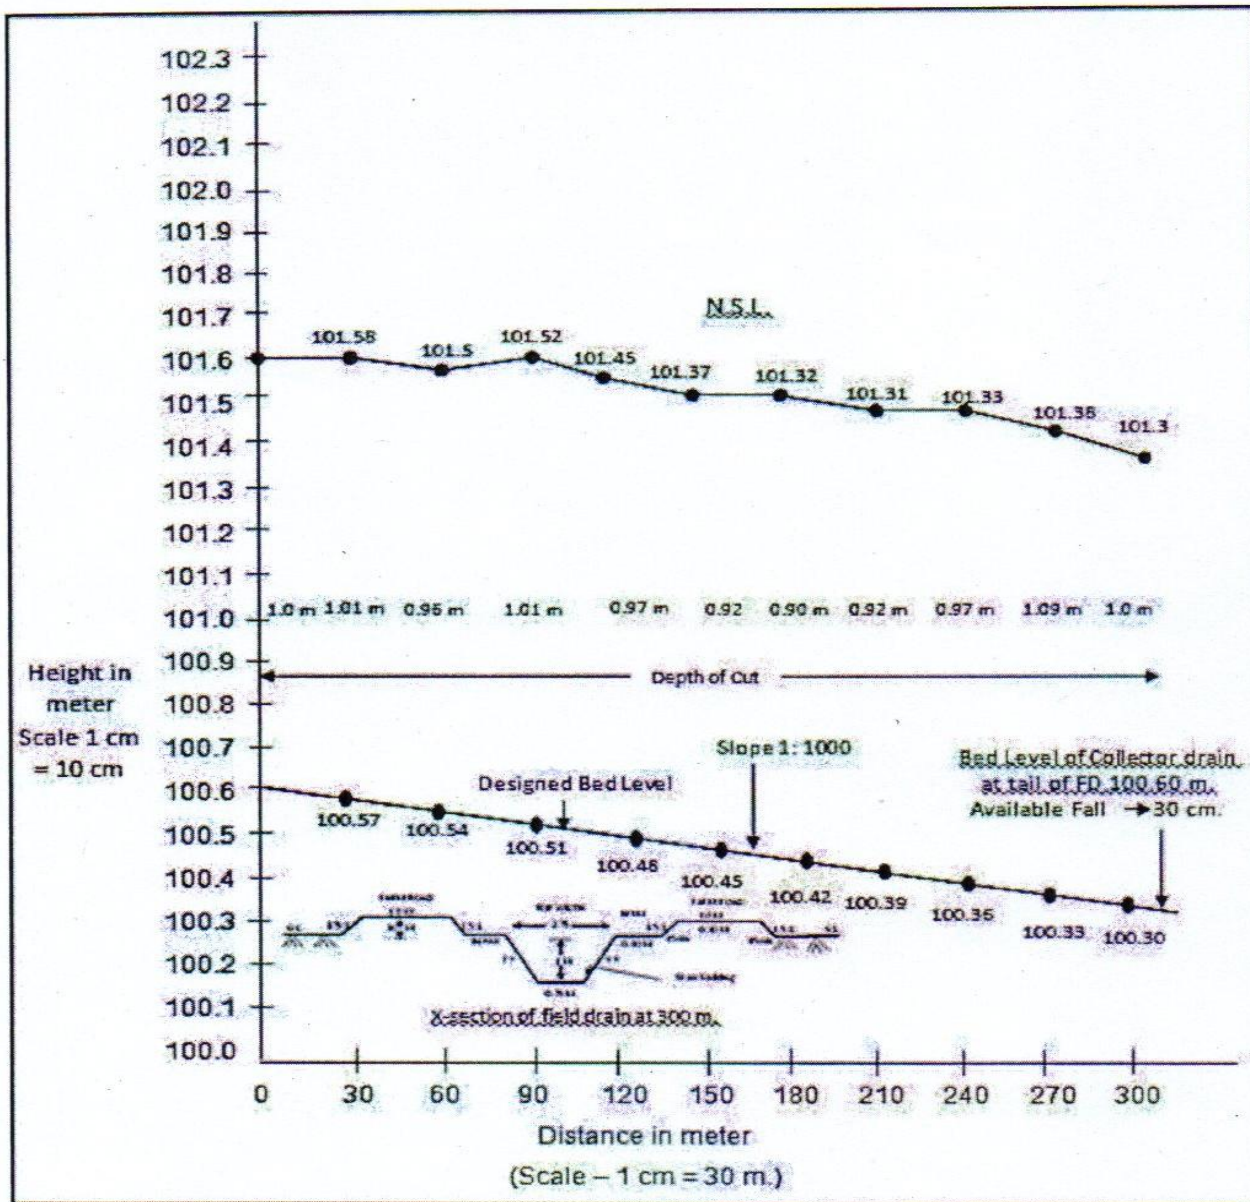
Designed L-Section and Cross-Section of Field Drain
